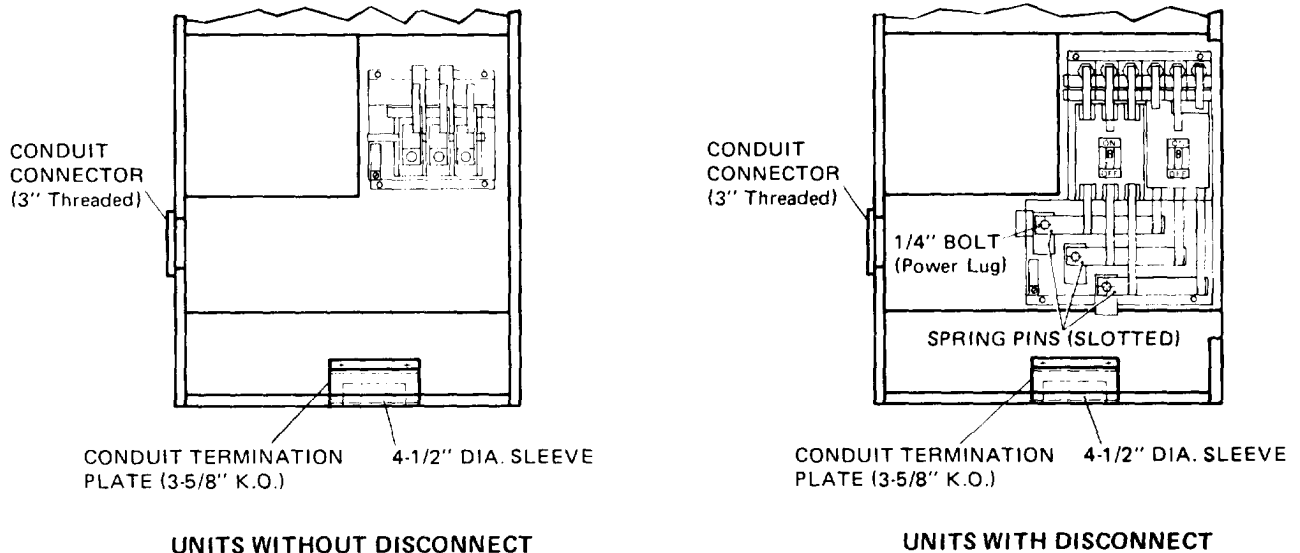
BOTTOM POWER WIRING ENTRANCE
